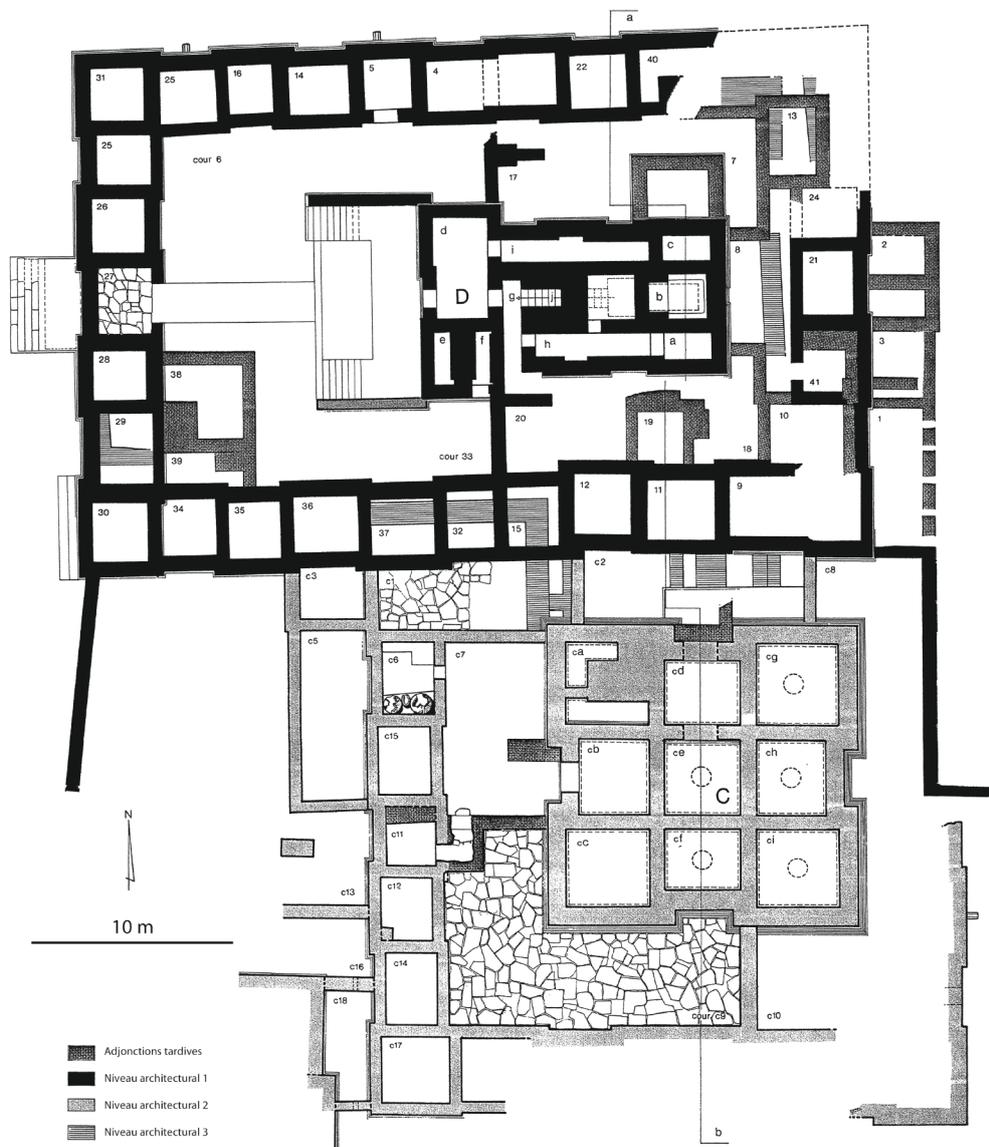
Plan of monuments C and D (drawing: J. Gire).
